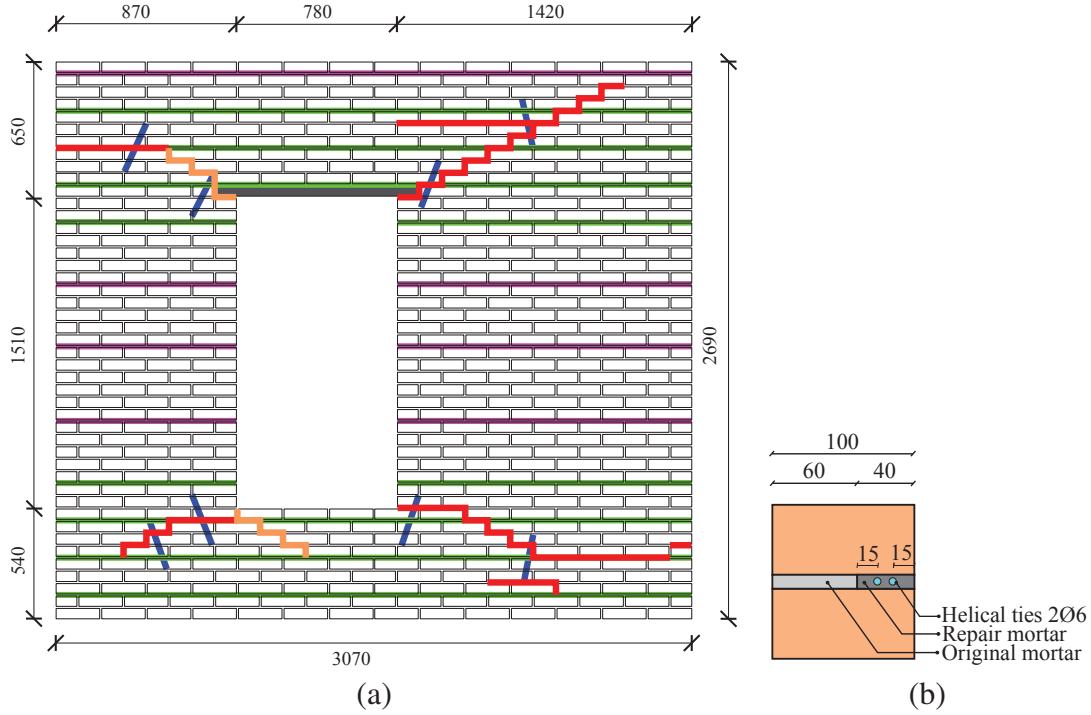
a) Layout of strengthened masonry wall. Pre-damage in orange, post-damage in red. Single bed joint bars in purple, double bed joint bars in green, diagonal anchors in blue. b) Cross-section of repointed joint. All dimensions in *mm*.
